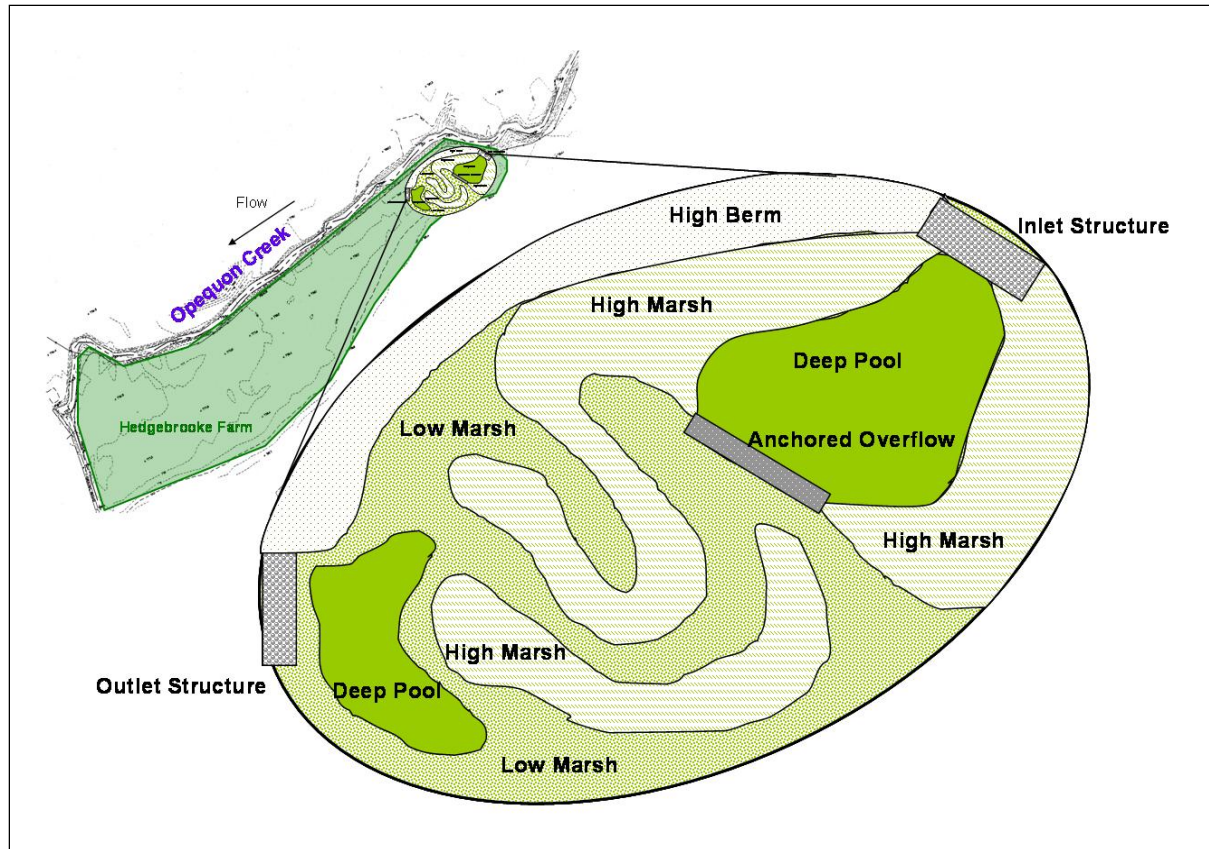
Plan view of a constructed floodplain wetland along the Opequon Creek near Winchester.
